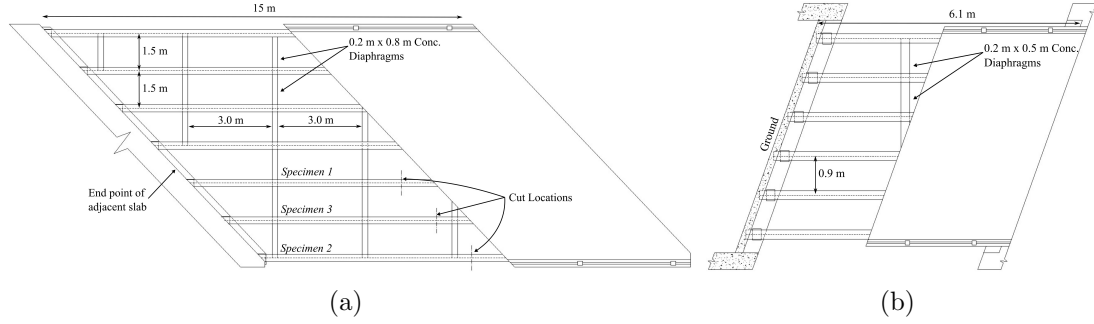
Plane view of (a) the outer span of Bridge A and (b) Bridge B.
